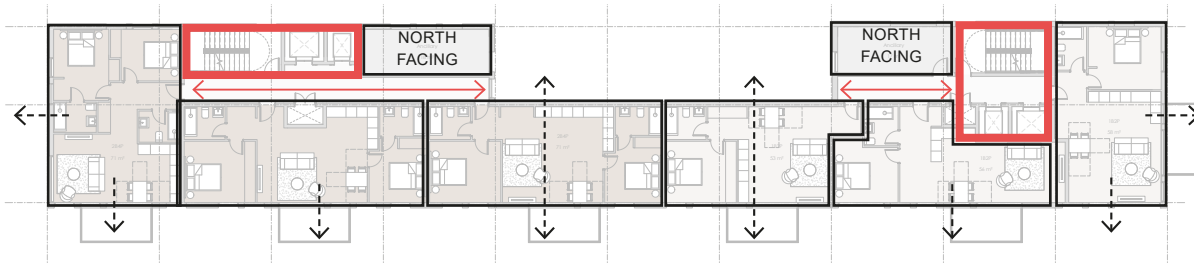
Plot 10 A - Level 02 (Typical Full Floor Plan)
